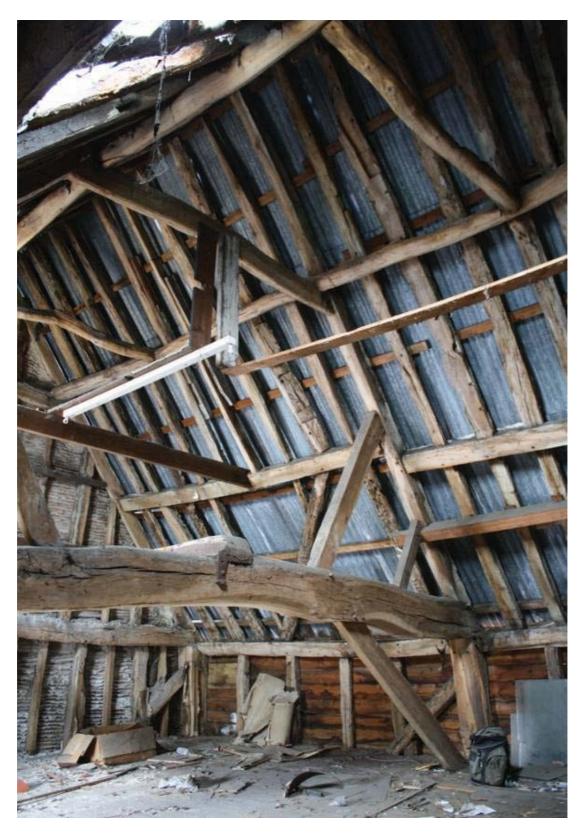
First floor and roof structure of Cottage (Building 4), looking north-west.
